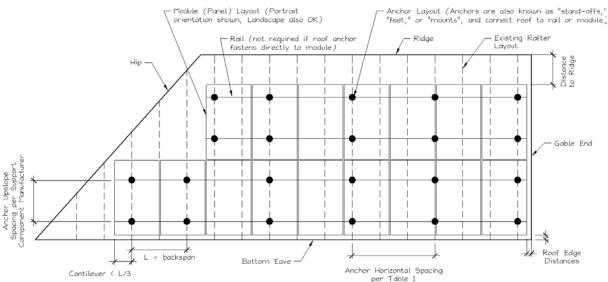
Sample Solar Panel Array Layout Diagram (Roof Plan)
